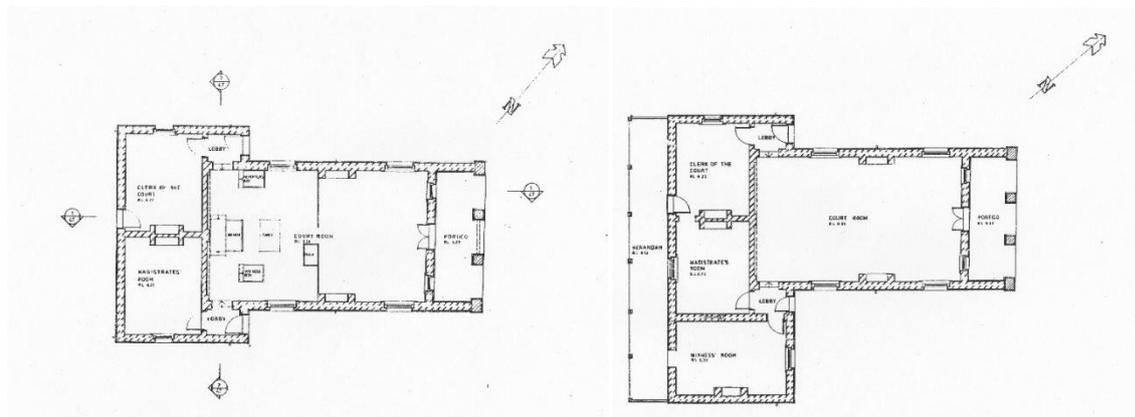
1858 Court House as built on the left and addition of Witness Room on the right
